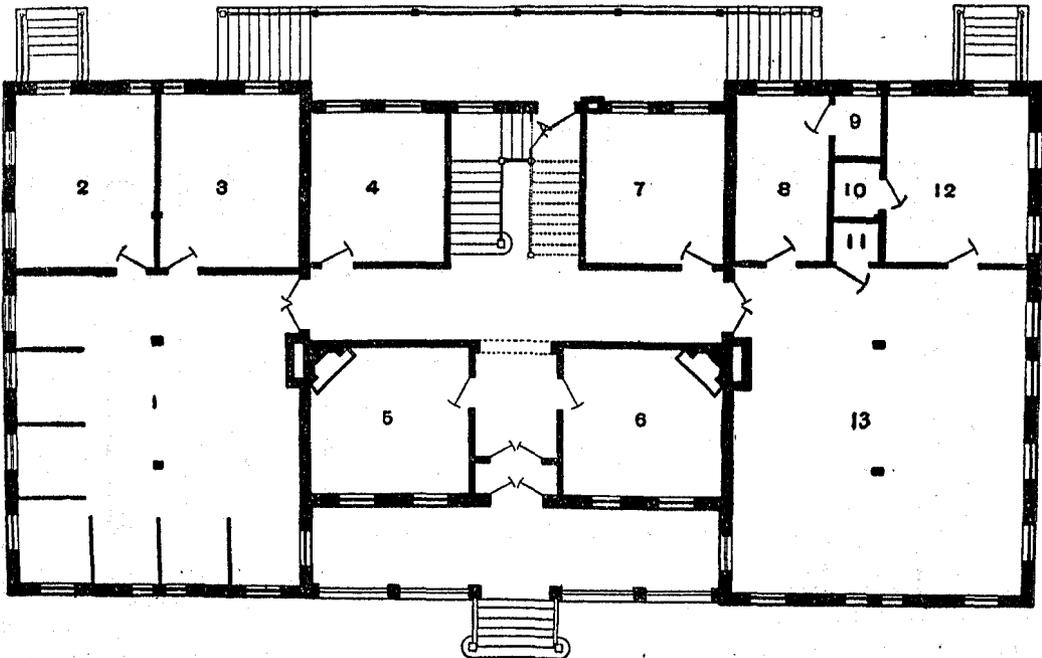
Plan of main floor of laboratory building. 1, General laboratory; 2, library; 3, chemical laboratory; 4, sterilizing and embedding room; 5, general office; 6, director's office; 7, stock room; 8, packing room; 9, closet for office storage; 10, alcohol closet; 11, janitor's closet; 12, preparation room; 13, museum.
